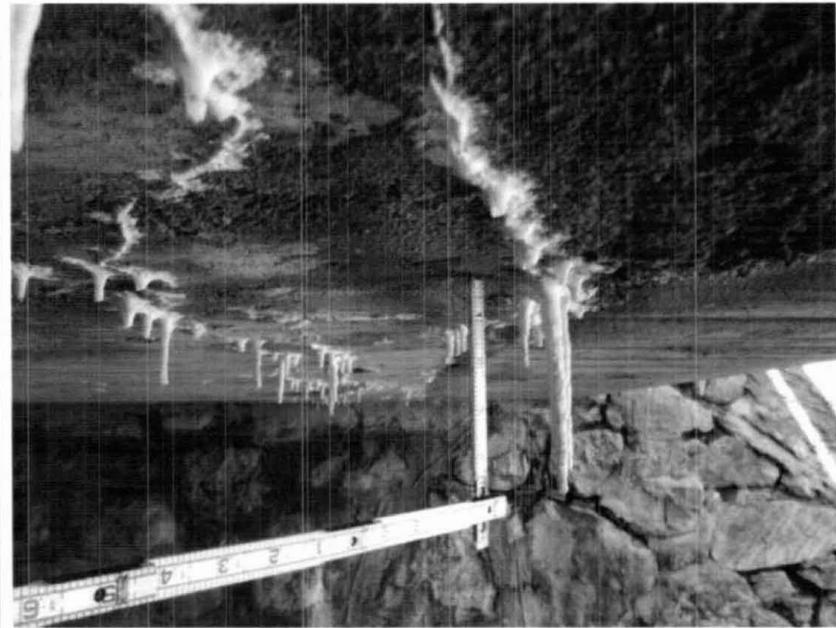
NORTH END OF UNDERSIDE SHOWING HEAVY EFFLO. AND 6 IN. ± CANDLES.
